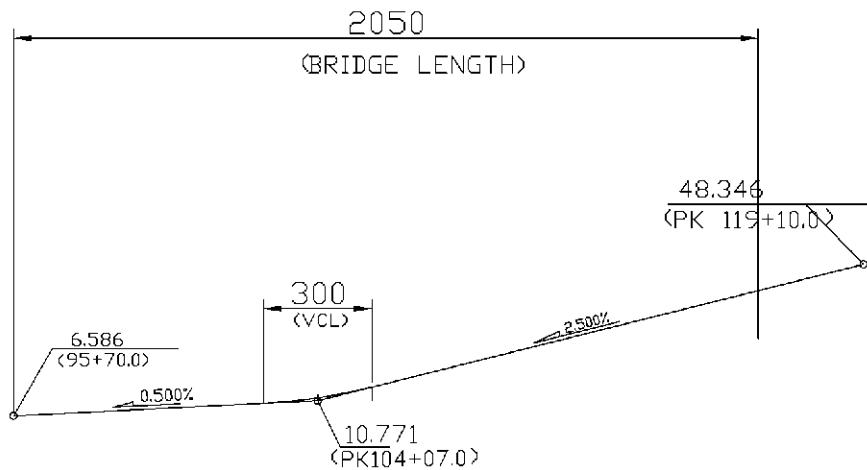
Horizontal and Vertical Alignments at the Mykolaiv Bridge
